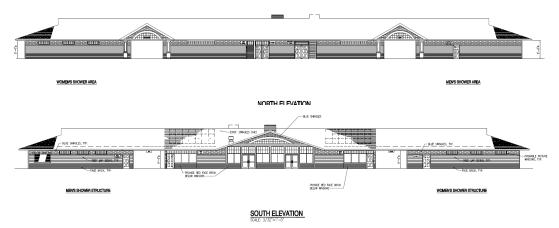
Field 5 Bathhouse Exterior Elevations with Higher-End Exterior Aesthetics
